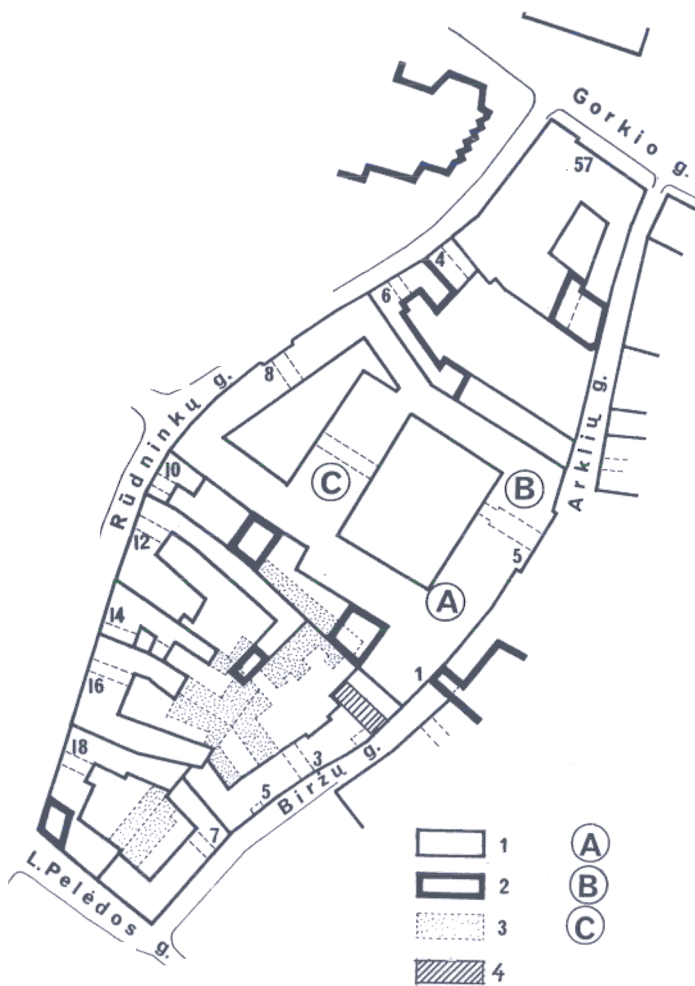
The plan of insula 54 of the old town. 1: historic buildings; 2: new buildings; 3: demolished buildings; 4: the Gothic house, No. 3 Biržų Street; A: Youth Theatre; B: Puppet Theatre; C: Conservation Centre.
